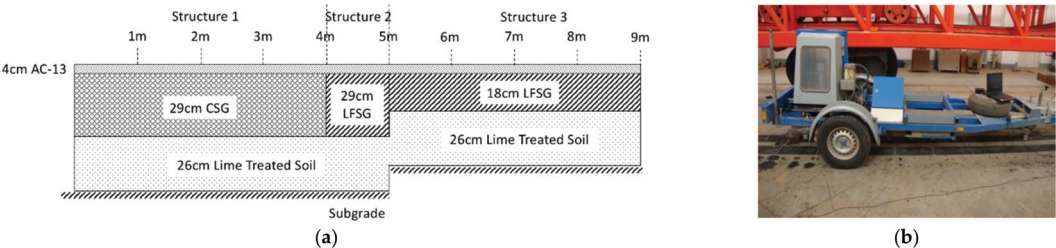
Full-scale pavement structure design (a) and FWD test in the full-scale pavement (b).
